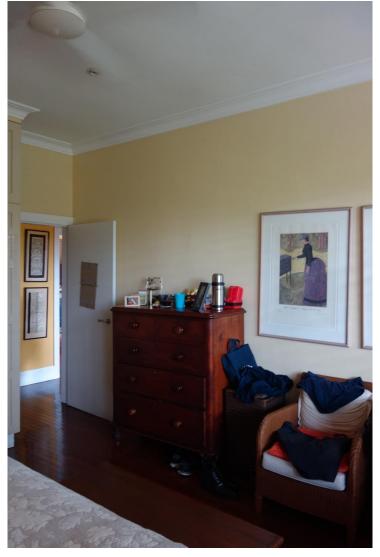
View into the main bedroom in the north-east corner of the house. Note the timber floor, new ceilings and window, but no wall grates.
